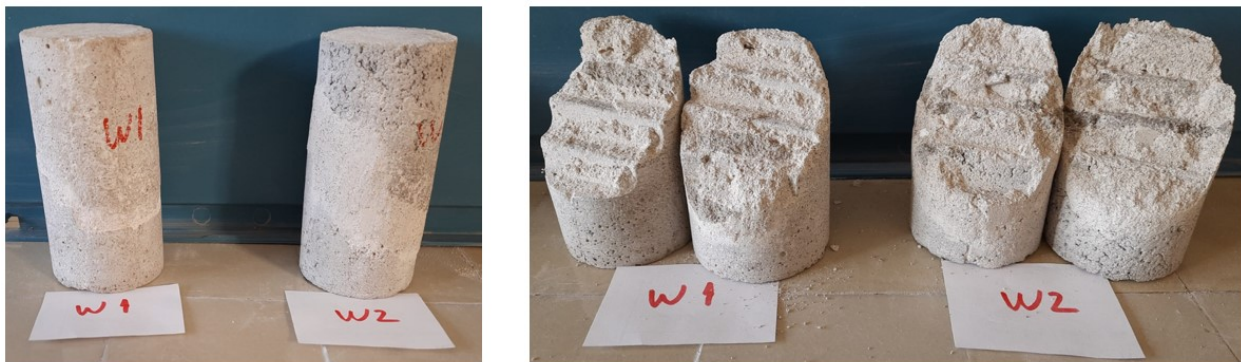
Before test and after test images of concrete samples with wavy discontinuity planes
